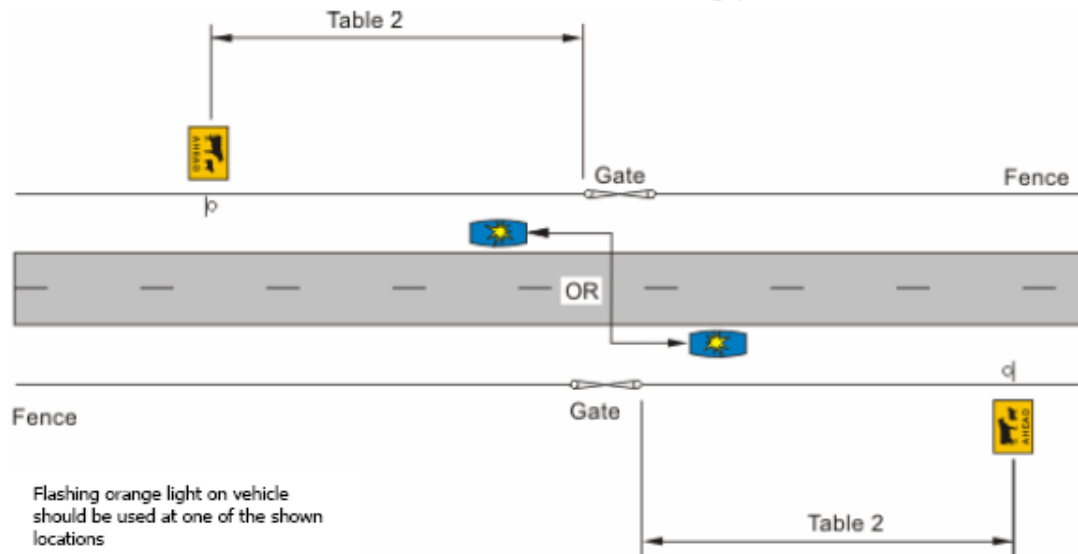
Typical Stock Crossing Site – for bitumen roads.
